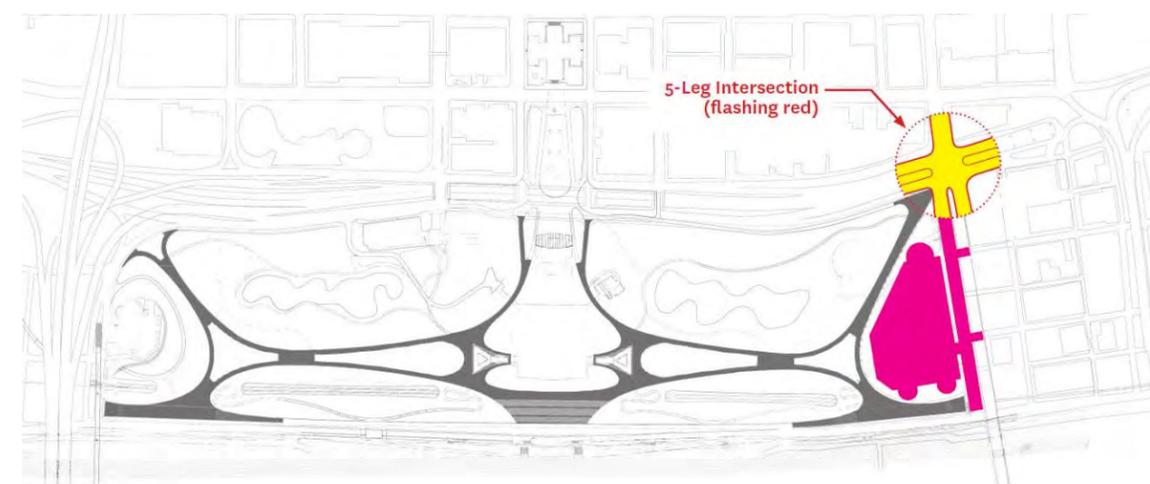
Washington Avenue/Memorial Drive/Eads Bridge Intersection
